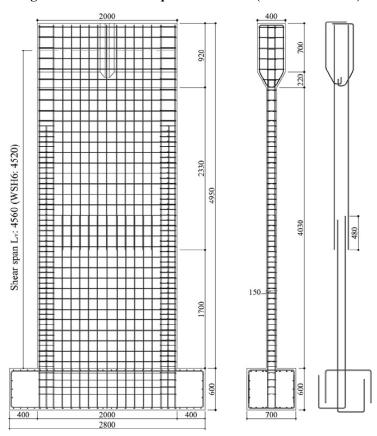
Elevation view of the specimen WSH3 (Dazio et al. 2009)
